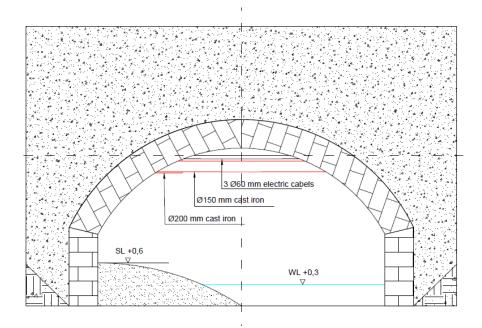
Schematic of the Suspended Pipe at Sarah Curran Bridge
